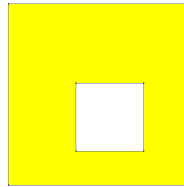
Geometry of a 4 m x 4 m façade exhibiting façade ID 11.
